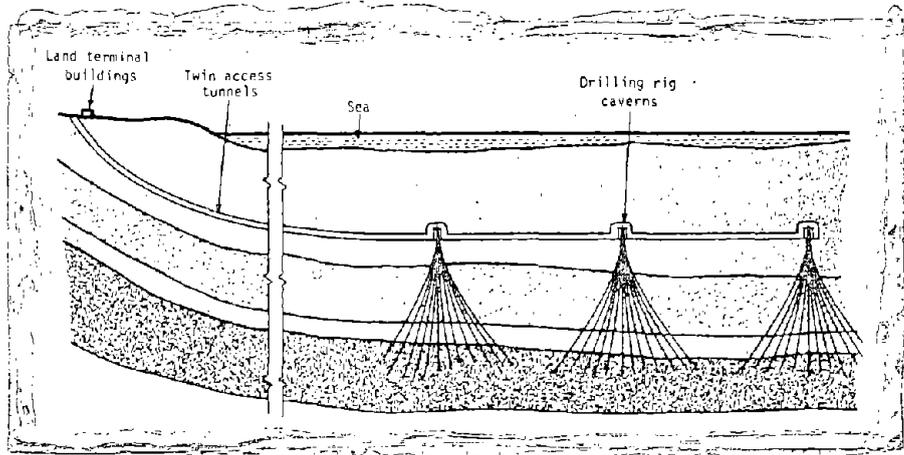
Proposed scheme for the establishment of oil production platforms in underground caverns and connected to the surface by tunnels.
